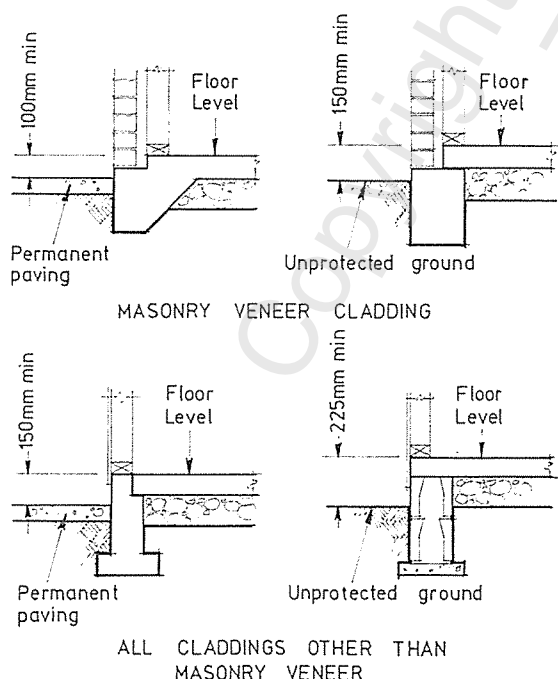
Minimum heights of finished concrete slab-on-ground floors above adjoining finished ground level
